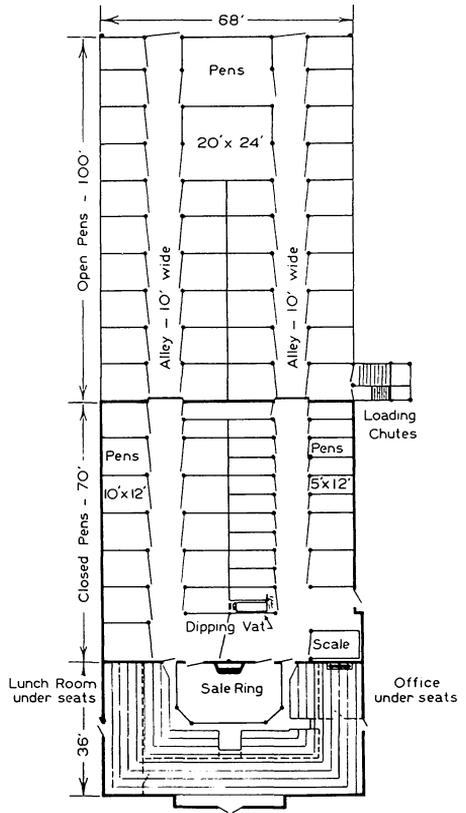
FLOOR PLAN OF A WELL-ARRANGED MINNESOTA AUCTION SALE BARN
